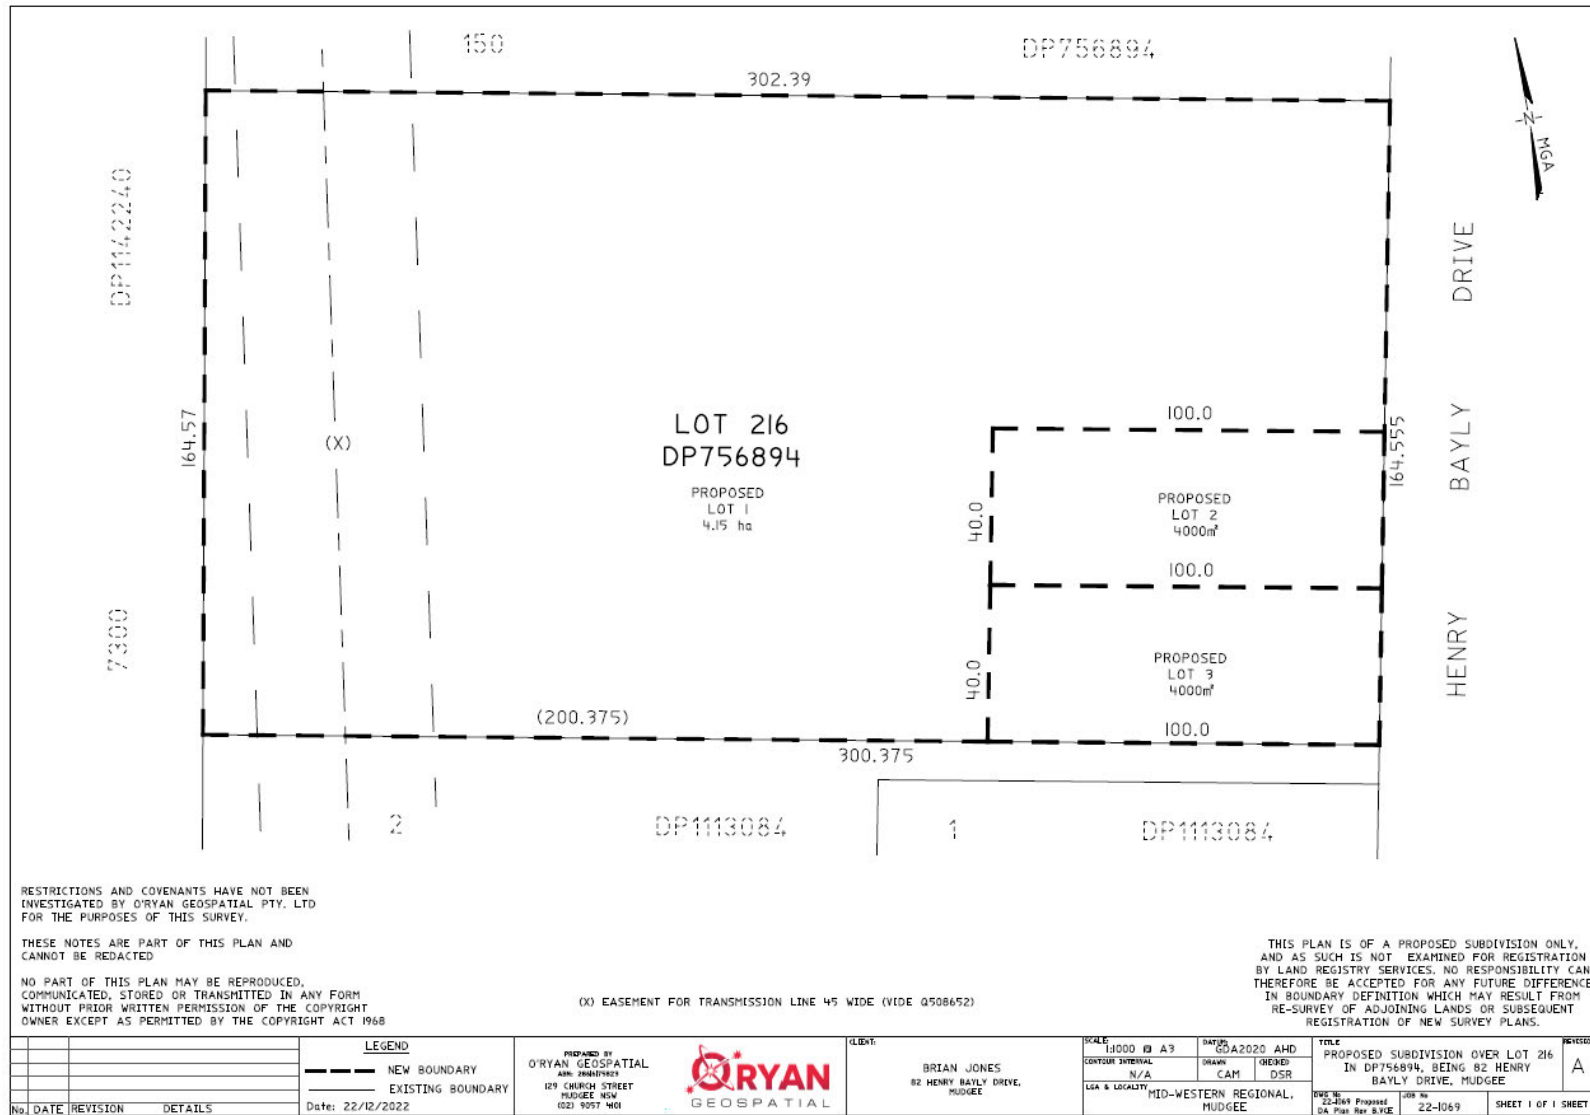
Site plan – additional lots to be created, proposed lot 2 and lot 3.
